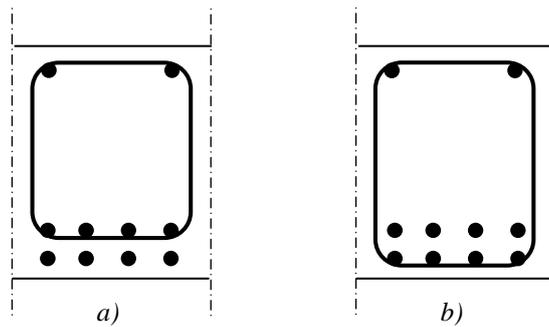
Different shear reinforcement configurations, a) the concrete must resist tensile stresses in the concrete, b) links enclosing all of the longitudinal reinforcement.
